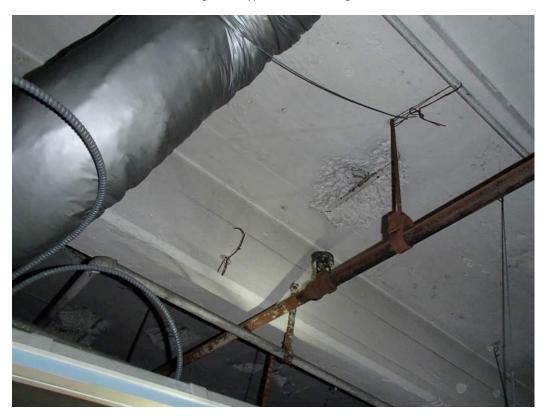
Typical Exposed Reinforcing Underside Level 2
